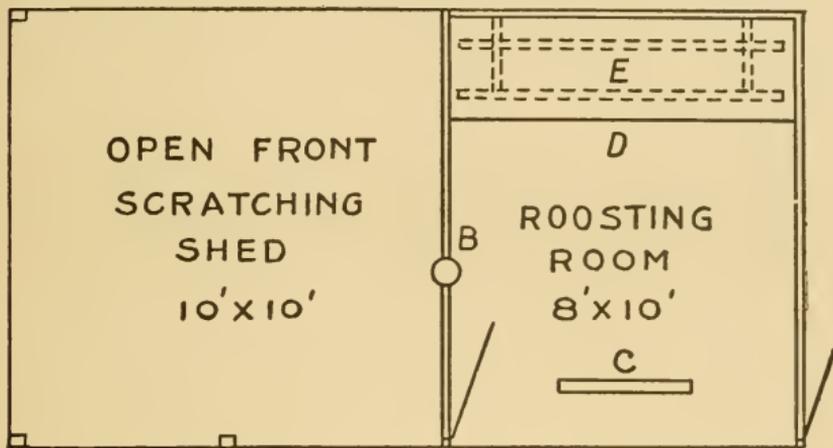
GROUND PLAN OF SCRATCHING SHED HOUSE
